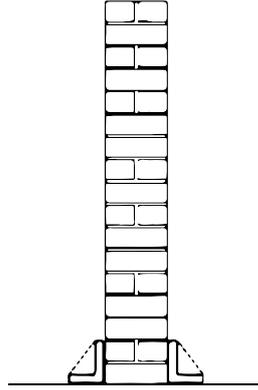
Cross-section of the walls tested on the shake table by (Giarretton et al., 2016).
